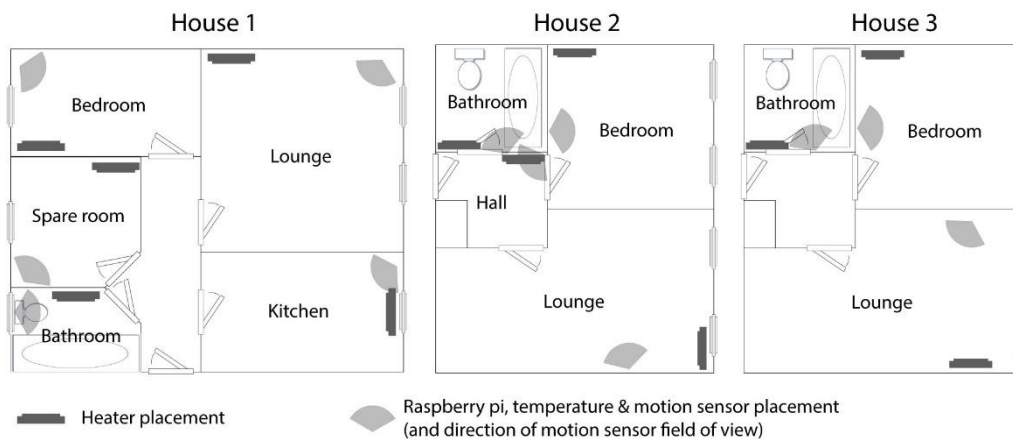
floor plans highlighting the placement of sensor kits and heaters in the participating households (diagrams are not to scale)
